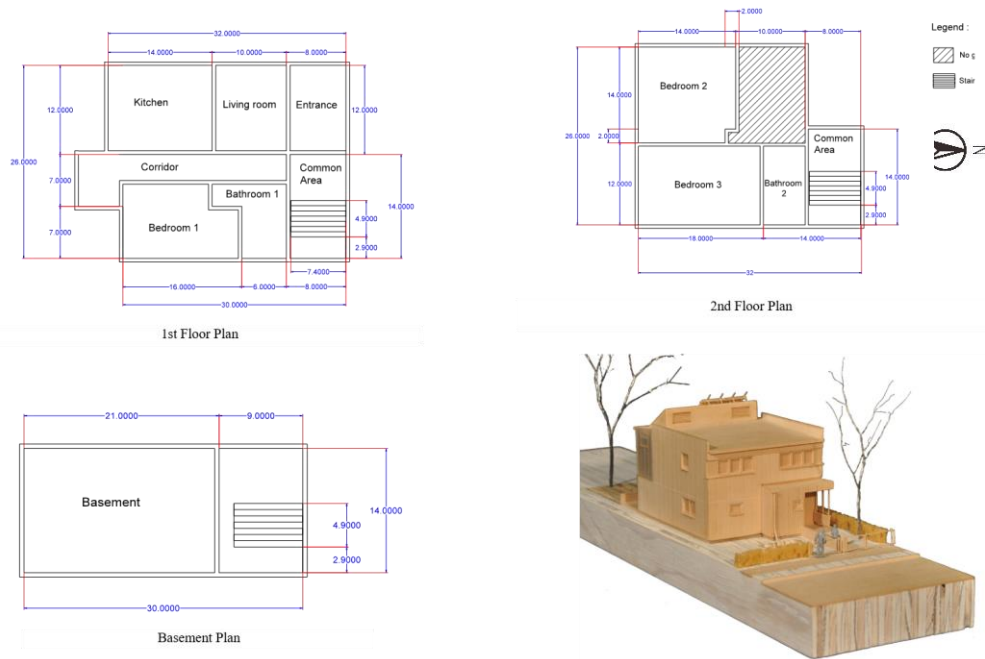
Layout of Syracuse reference house. Two conditioned floors with a total of 137.6 m² (1481 ft²) (calculated from wall central to wall central by original floor plans) of conditioned space. All rooms have the same height 2.43 m (8 ft) except that the living/family room has a double room height.
